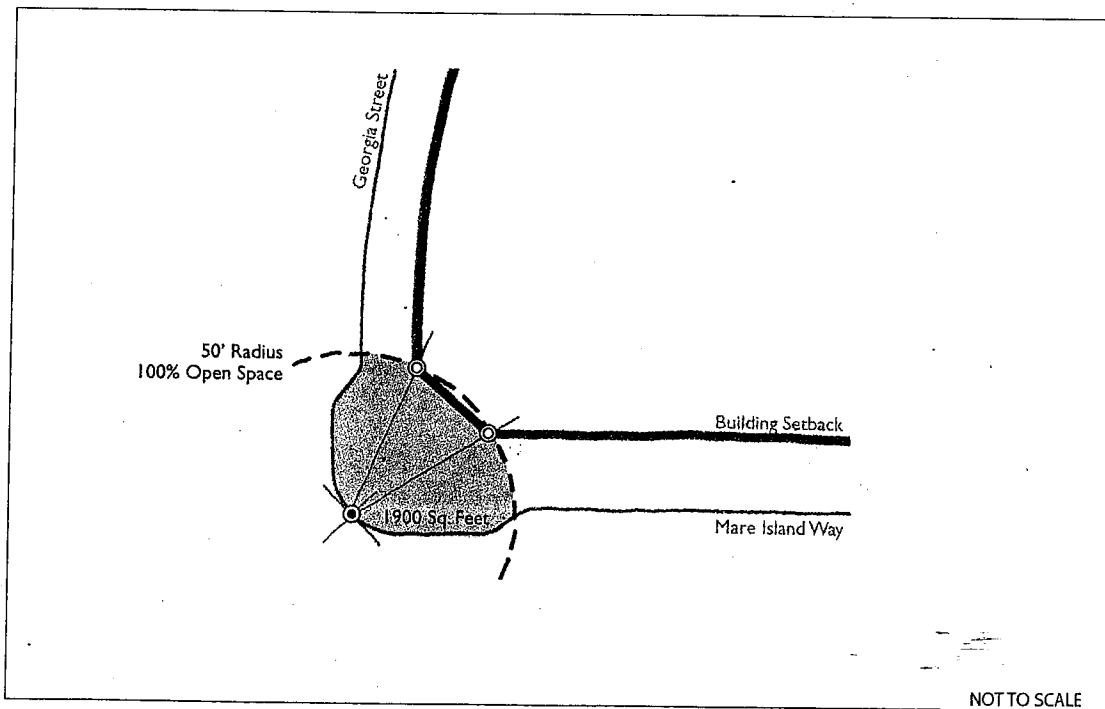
Corner Plaza Diagram, Mare Island Way & Georgia Street
